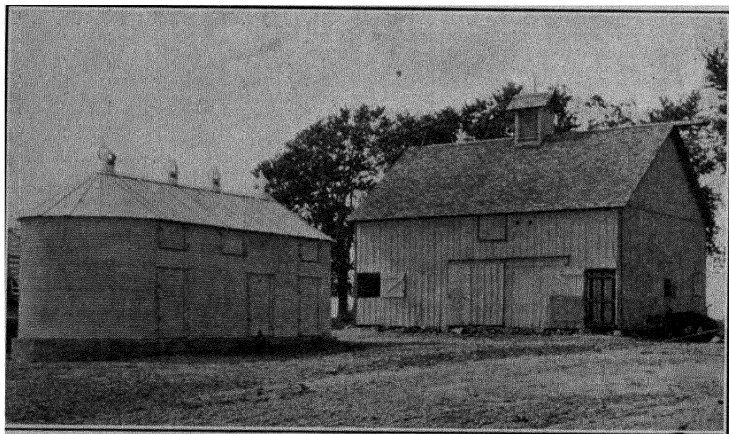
A steel corn crib on a concrete base makes an ideal place to store corn.
